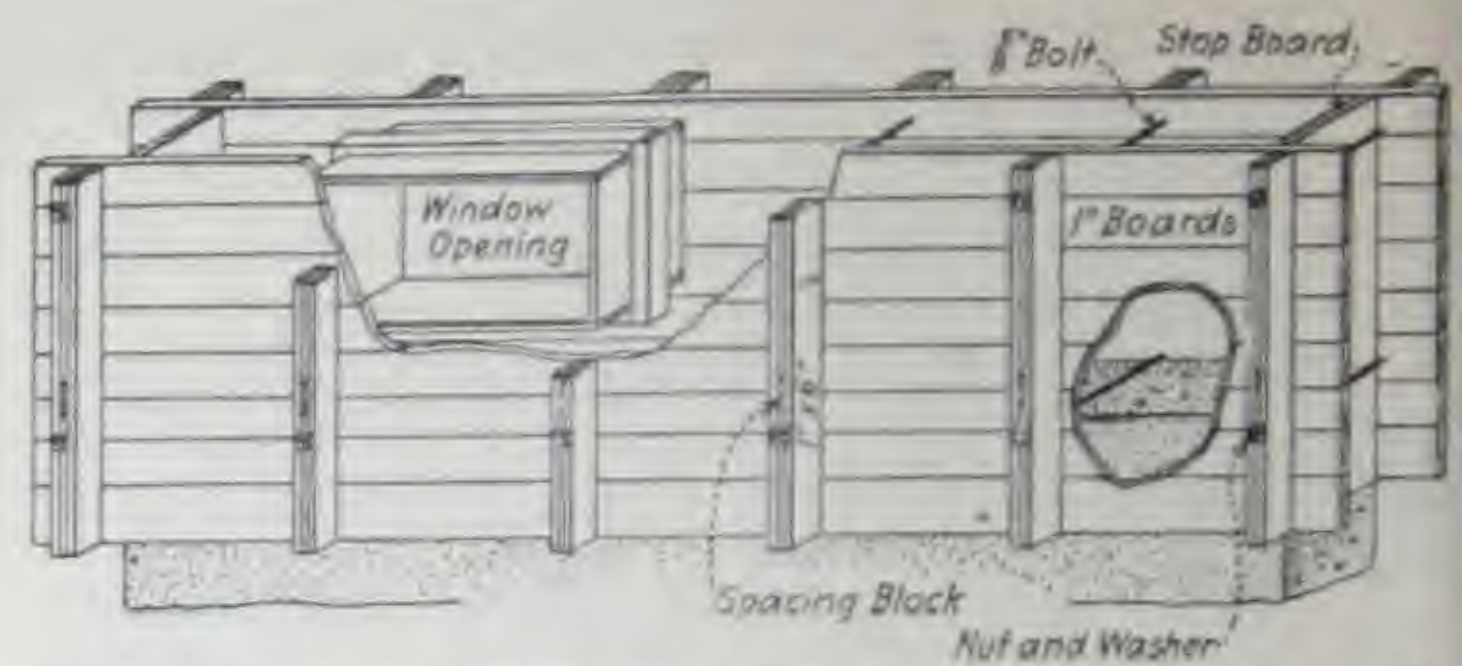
Arrangement of form when window is to be inserted—Sectional form to be raised as wall is built up and used over and over.
